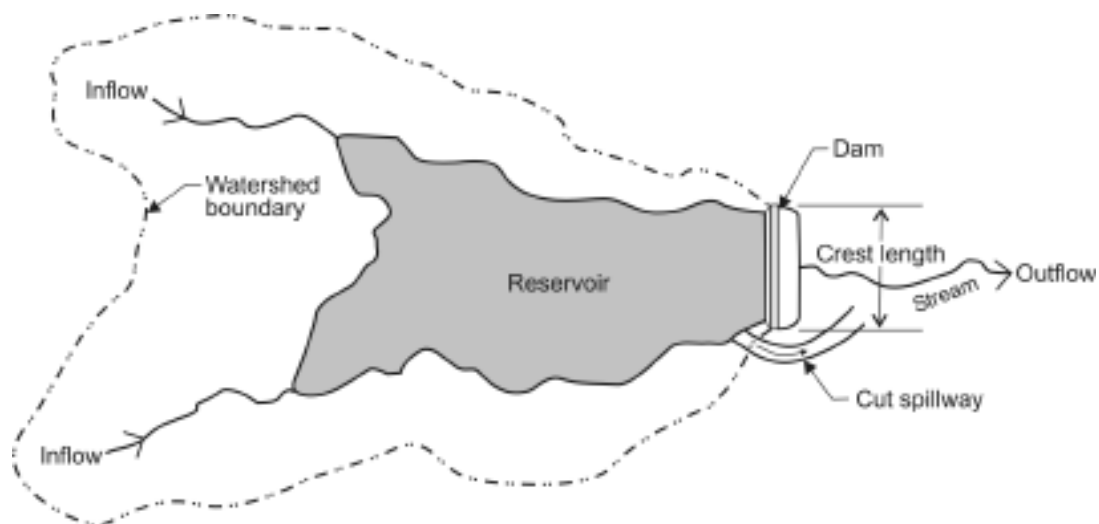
Plan view of dam and reservoir (Source: WEDC, UK)
